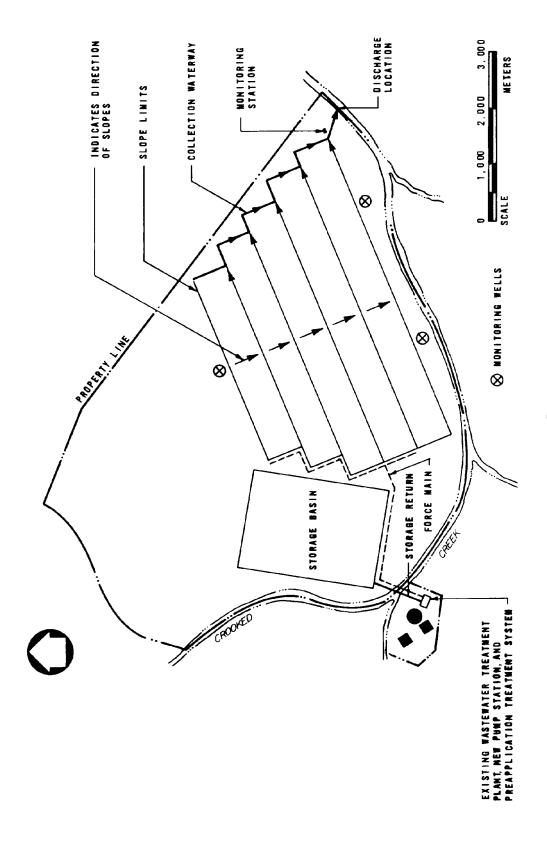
OVERLAND FLOW SYSTEM LAYOUT
